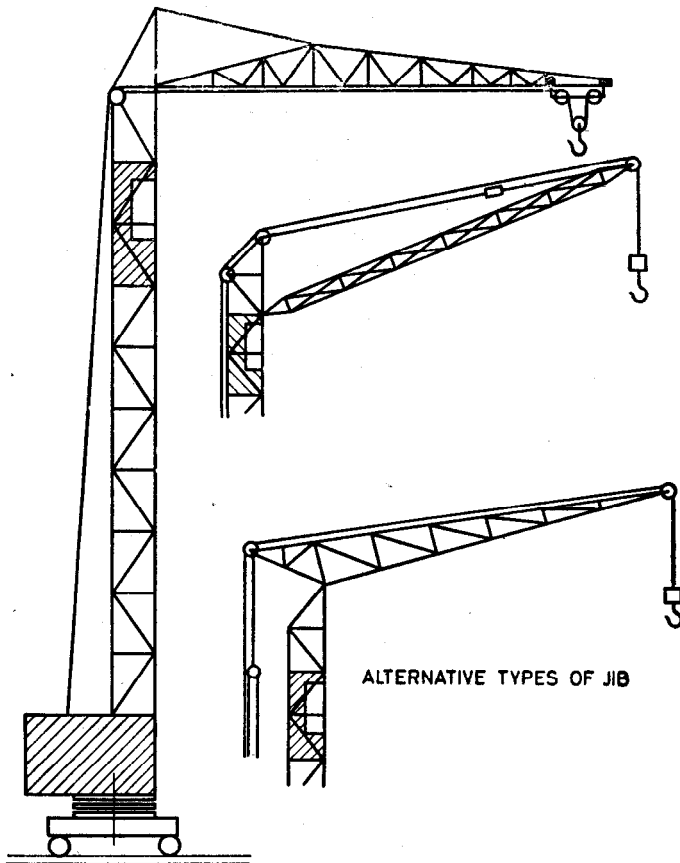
TOWER CRANE MOUNTED ON RAILS WITH SLEWING TOWER
